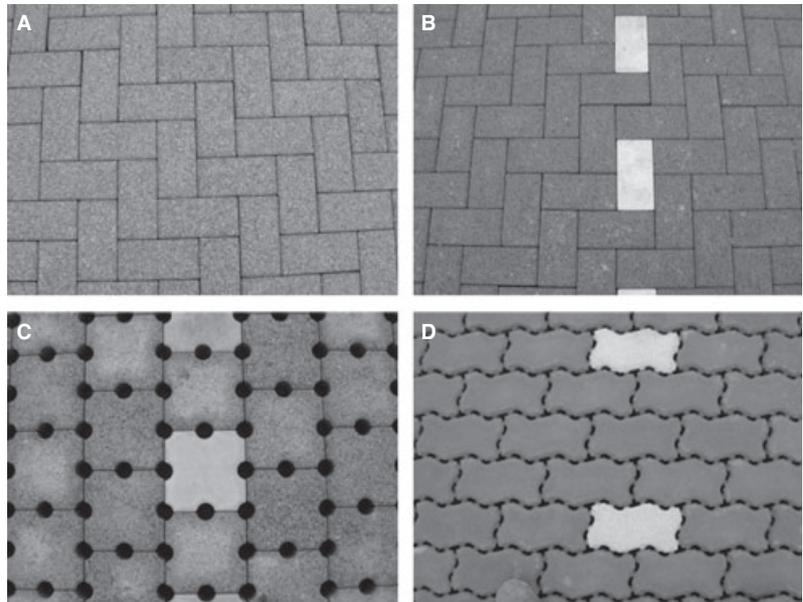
Concrete pavings used in this study: paver type and corresponding laying pattern (in brackets). (A) Conventional pavers (herringbone pattern), (B) porous pavers (herringbone pattern), (C) pavers with draining holes (running bond) and (D) pavers with enlarged joints (running bond).
